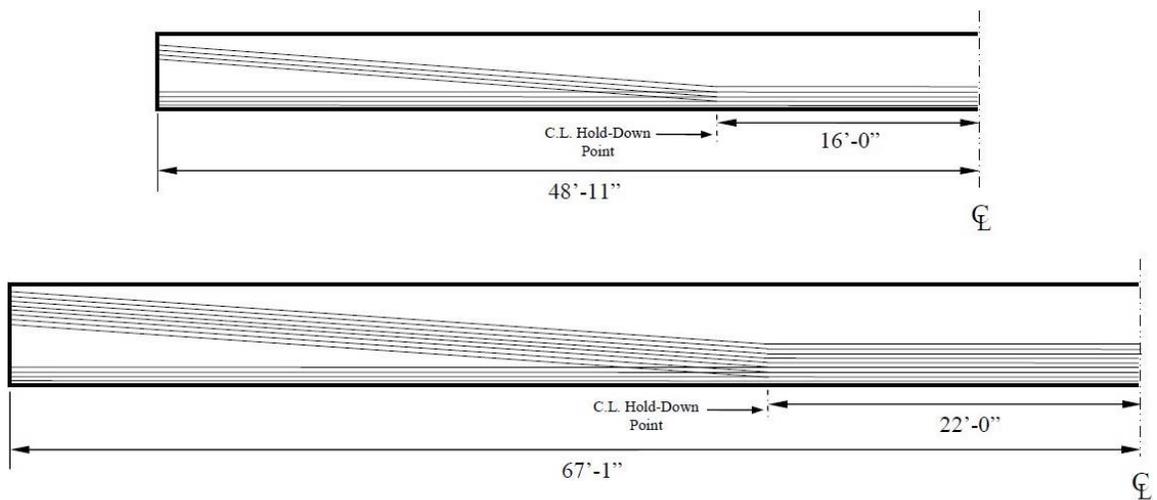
Profile of draped strands for (top) BT-54 girder and (bottom) BT-72 girders
